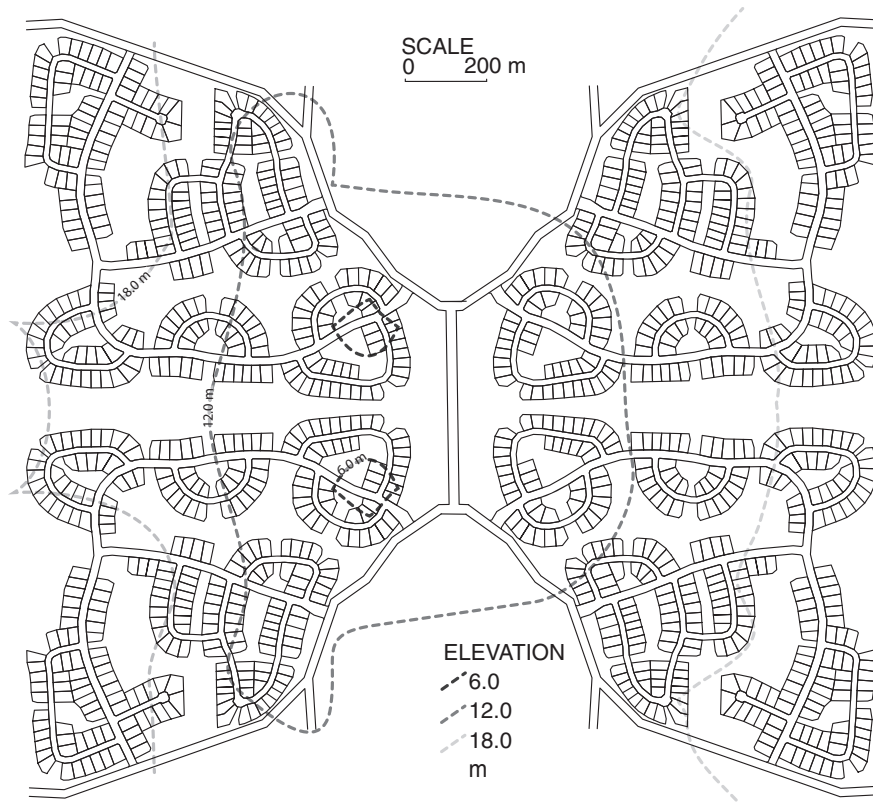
The greenfield development case study, showing the layout of the 1140 allotments and road network.
